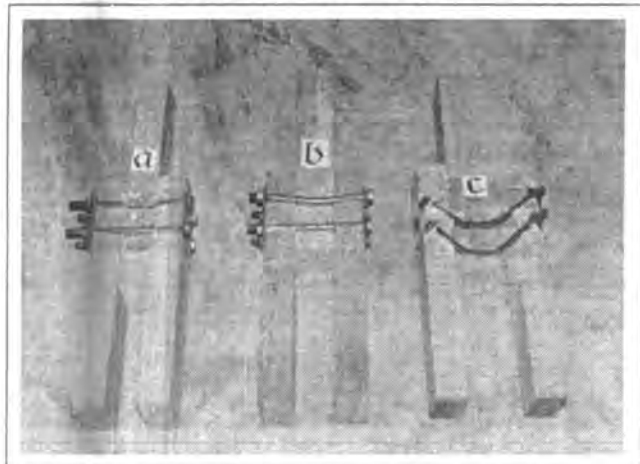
Sectional end elevation of Timber Joints Lunumidella timber and 9.5 mm steel bolts
